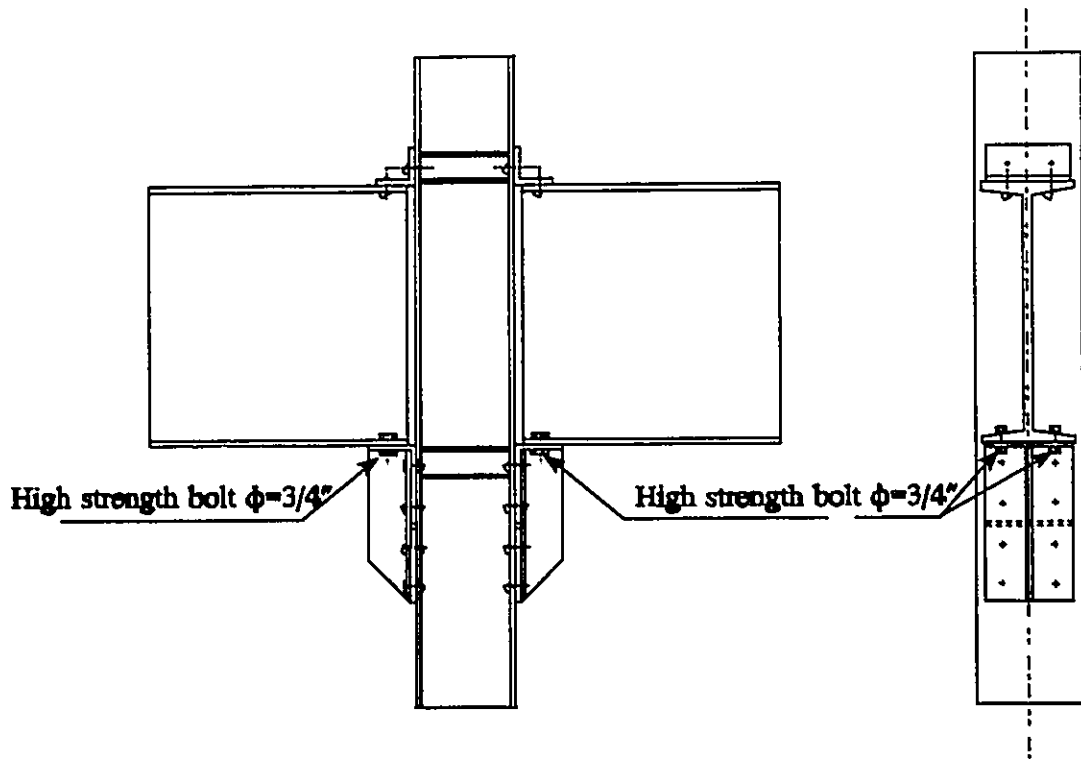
Connection detail 1 used for Specimen 2 and location of high strength bolts
